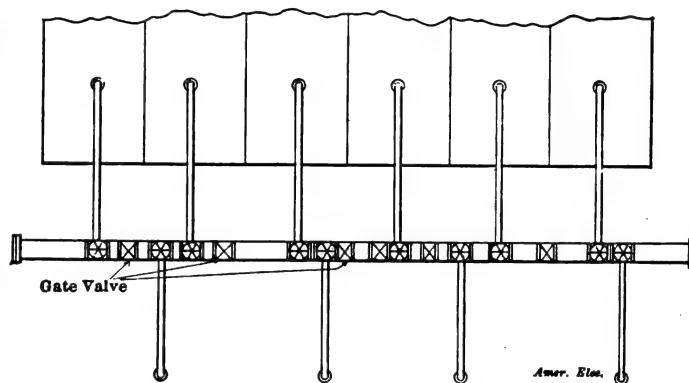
APPLICATION OF THE SECTIONAL SYSTEM STEAM PIPING.
